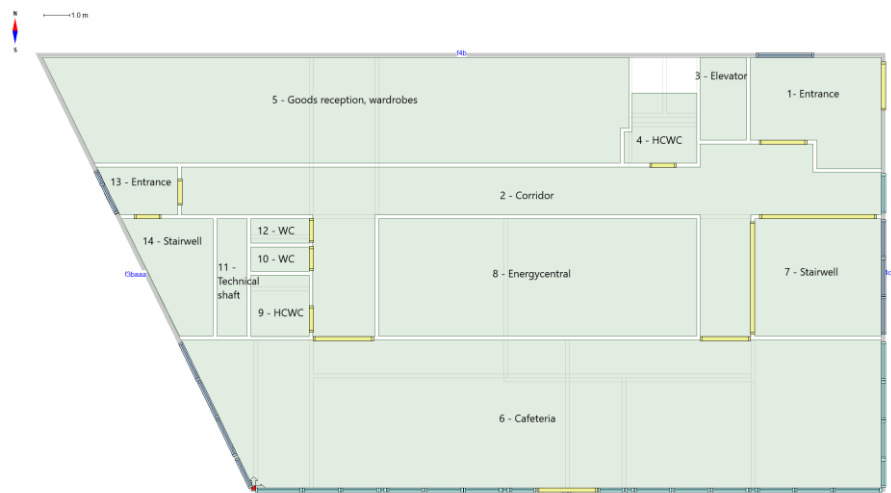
Floor plan of the 1st floor at ZEB lab, clipped for BEM in IDA ICE
